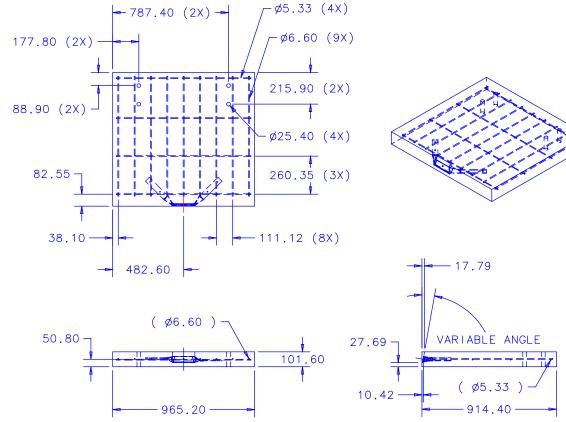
Concrete slab/connector details including steel reinforcing mesh.
